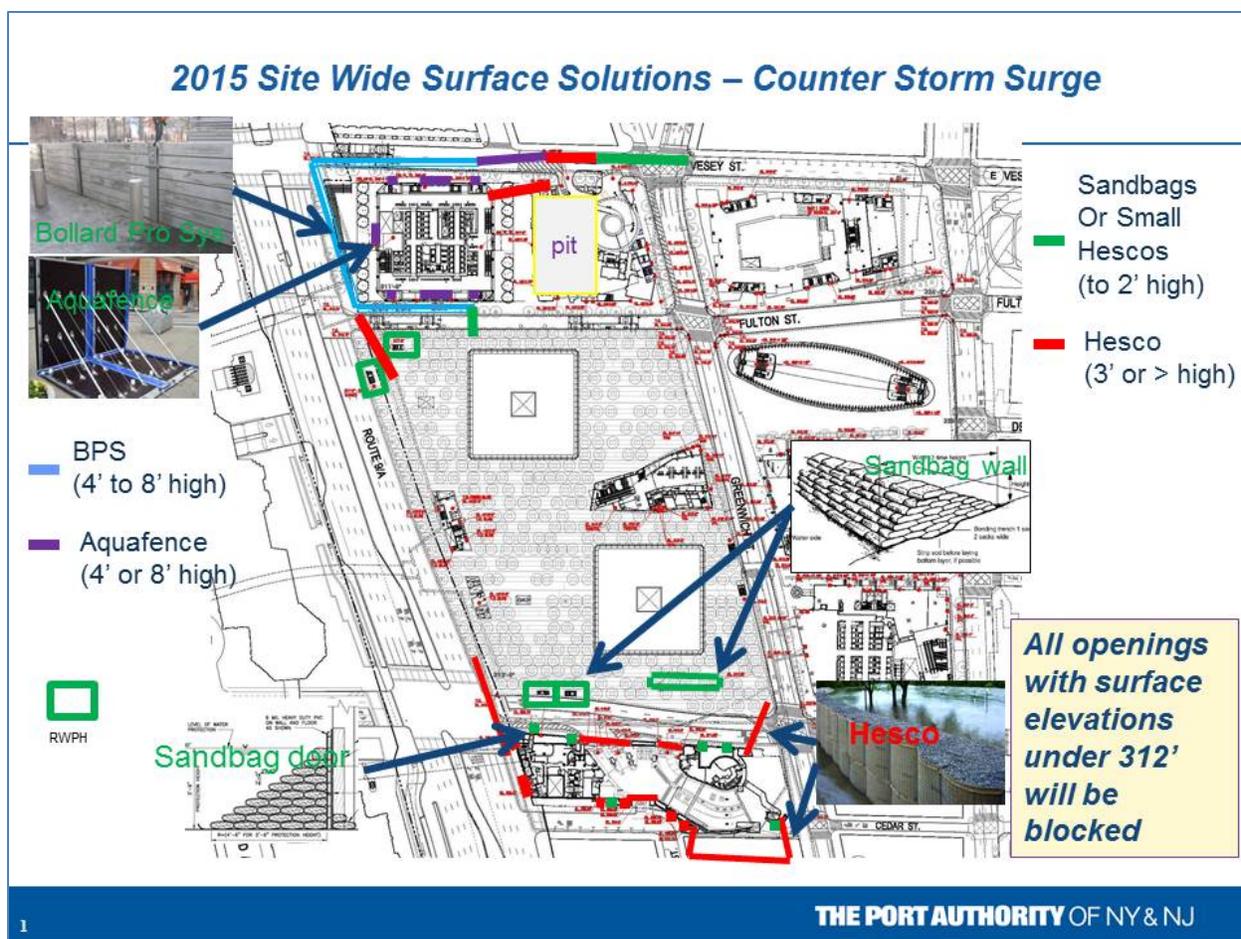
Tier 1 and Tier 2 Barrier Plan Schematic
